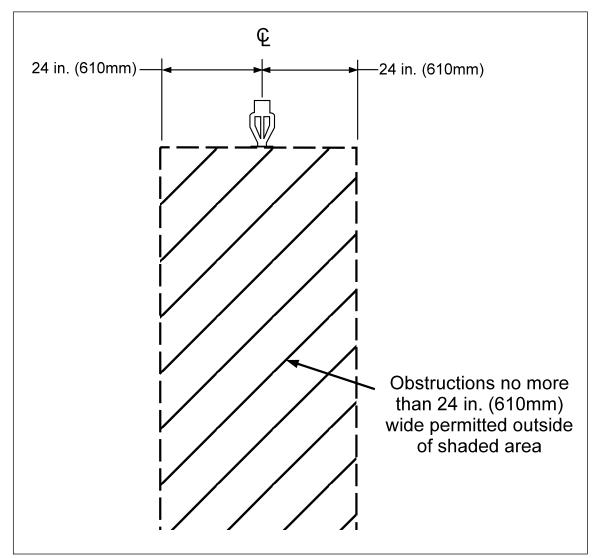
Obstructions below sprinklers wider than 1 ft (305 mm) and no wider than 2 ft (610 mm).
